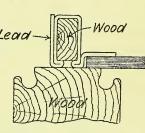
Deacon's Glazing on Wooden Bar.
